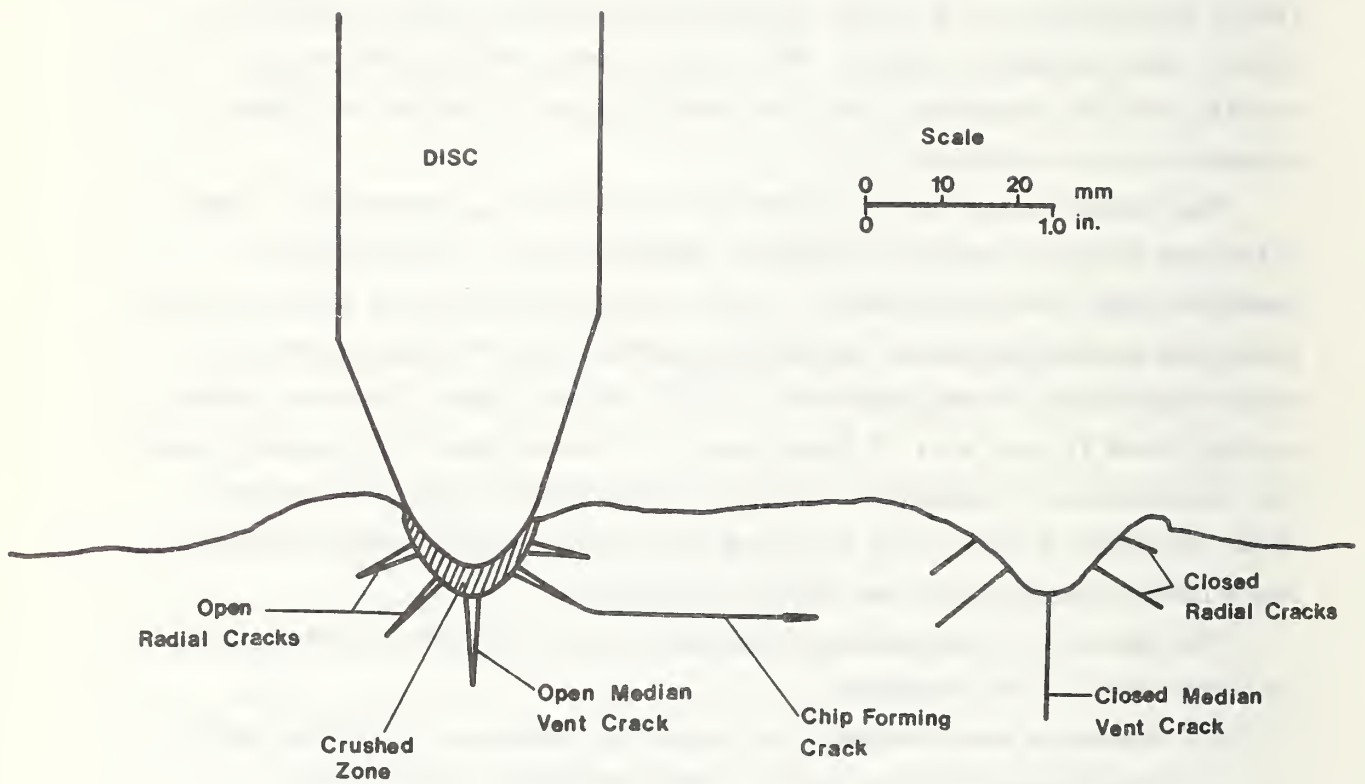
CROSS-SECTION VIEW OF DISC CUTTER PENETRATION AND ROCK FRACTURE BETWEEN TWO DISC CUTTER GROOVES
